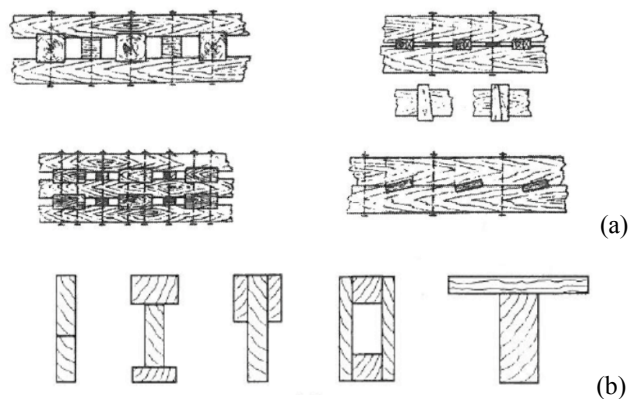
(a) Old and (b) modern construction examples of timber composite structures (beams and columns) (Ceccotti, 2003)
